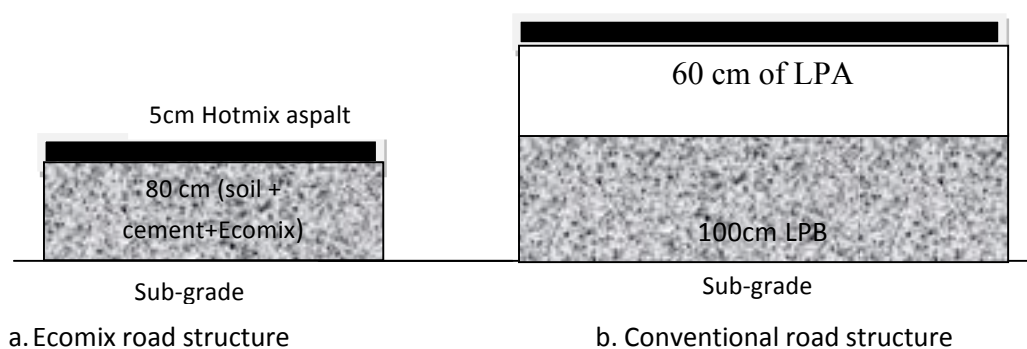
Cross section on conventional road and road structure that use ecomix additive material.
